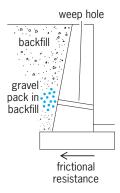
Retaining wall. Gravel pack behind the wall prevents the weep hole from clogging with soil.
